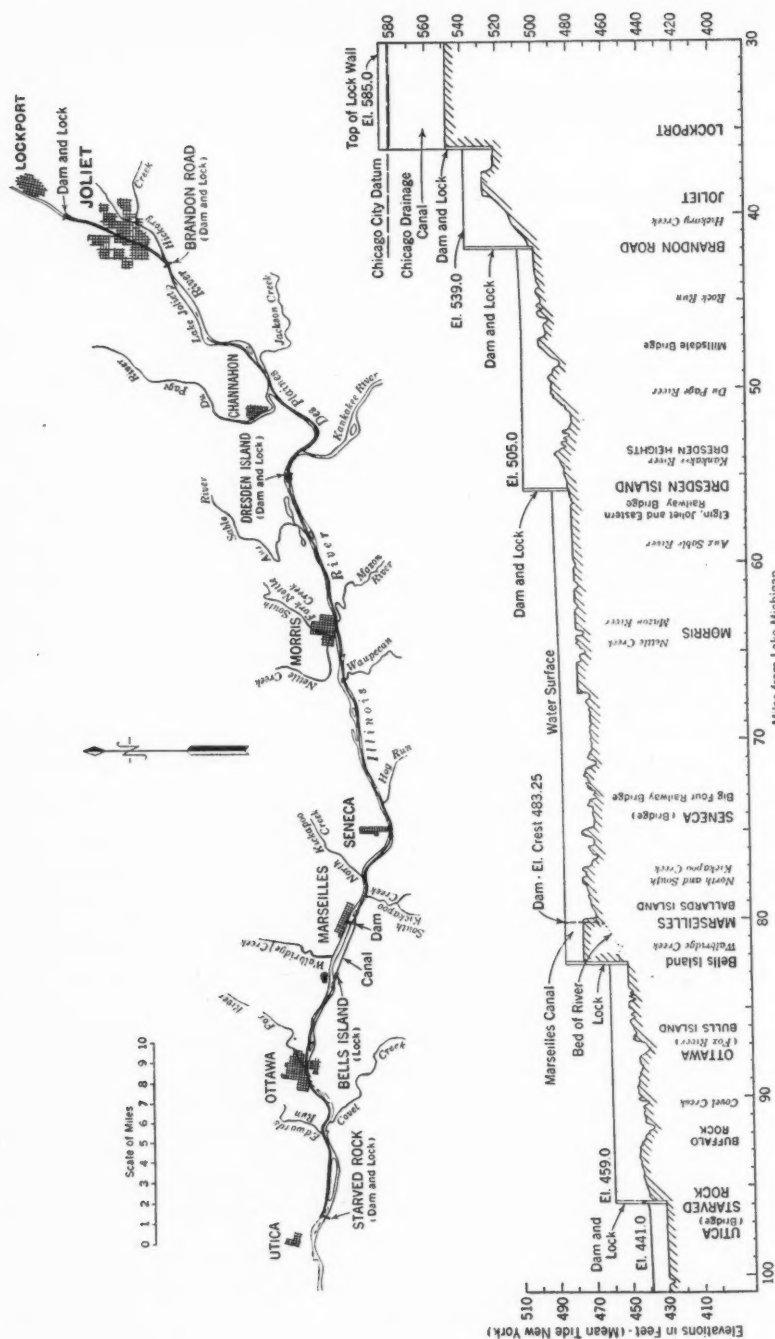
GENERAL PLAN AND PROFILE, ILLINOIS WATERWAY
